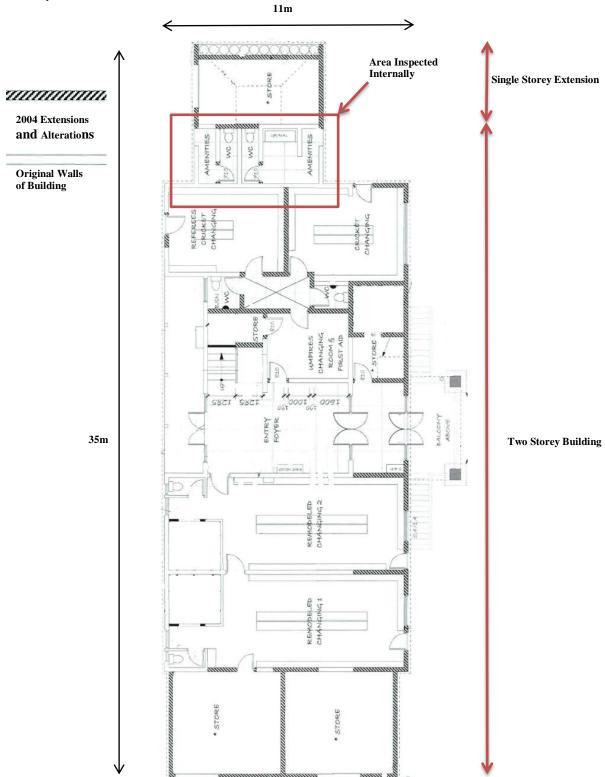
Plan of the Ground Floor Showing Key Structural Elements with Toilets Highlighted
